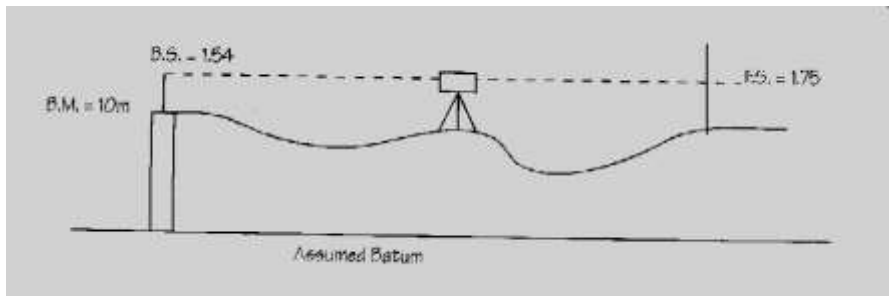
Surveying by Engineer's Level With 10 m Elevation of BM from Assumed Datum
